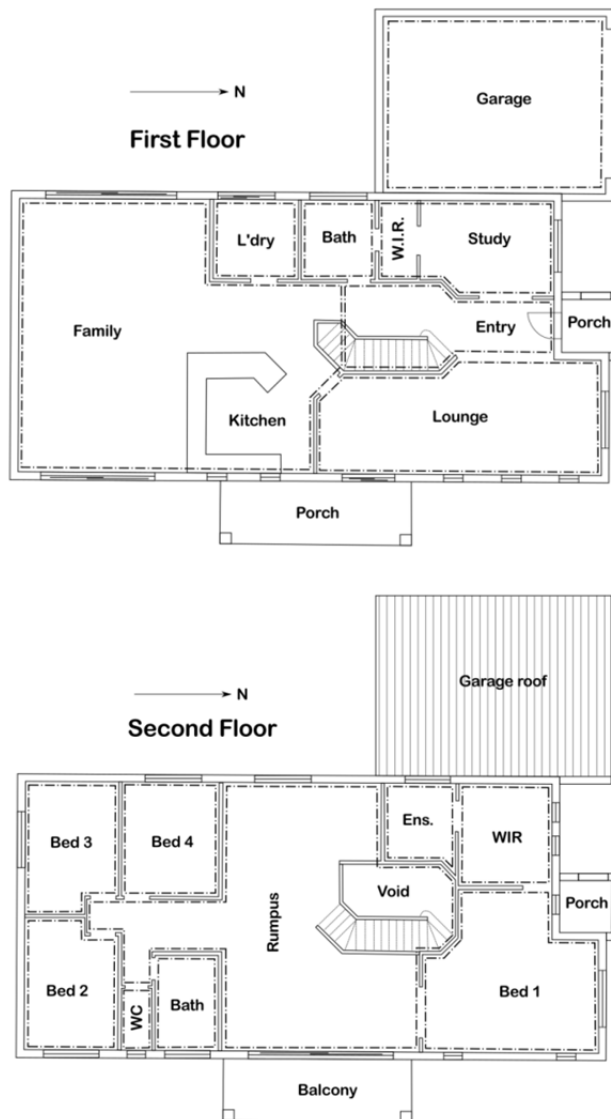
The house plan of first and the second floor with Thermal zones for simulation
